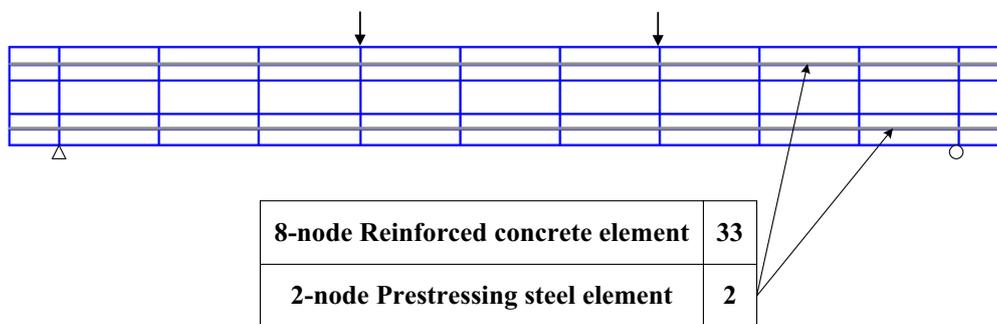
Finite element model for deteriorated prestressed concrete beams
